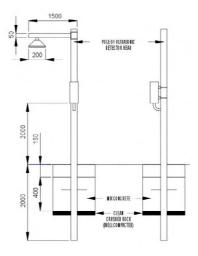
Standard Installation Plan for Detector and Cabinet
